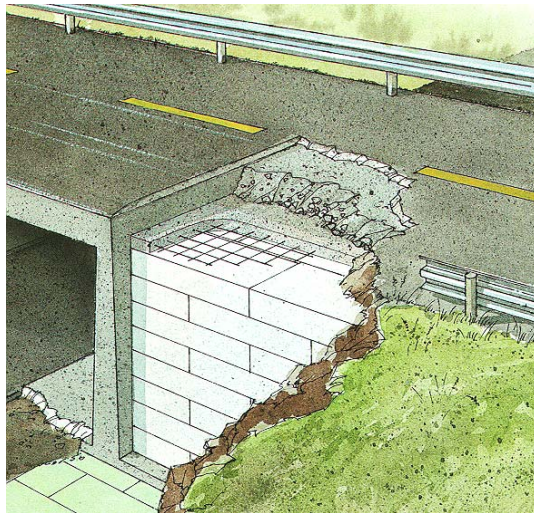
Backfill of Geofoam blocks against bridge abutment
